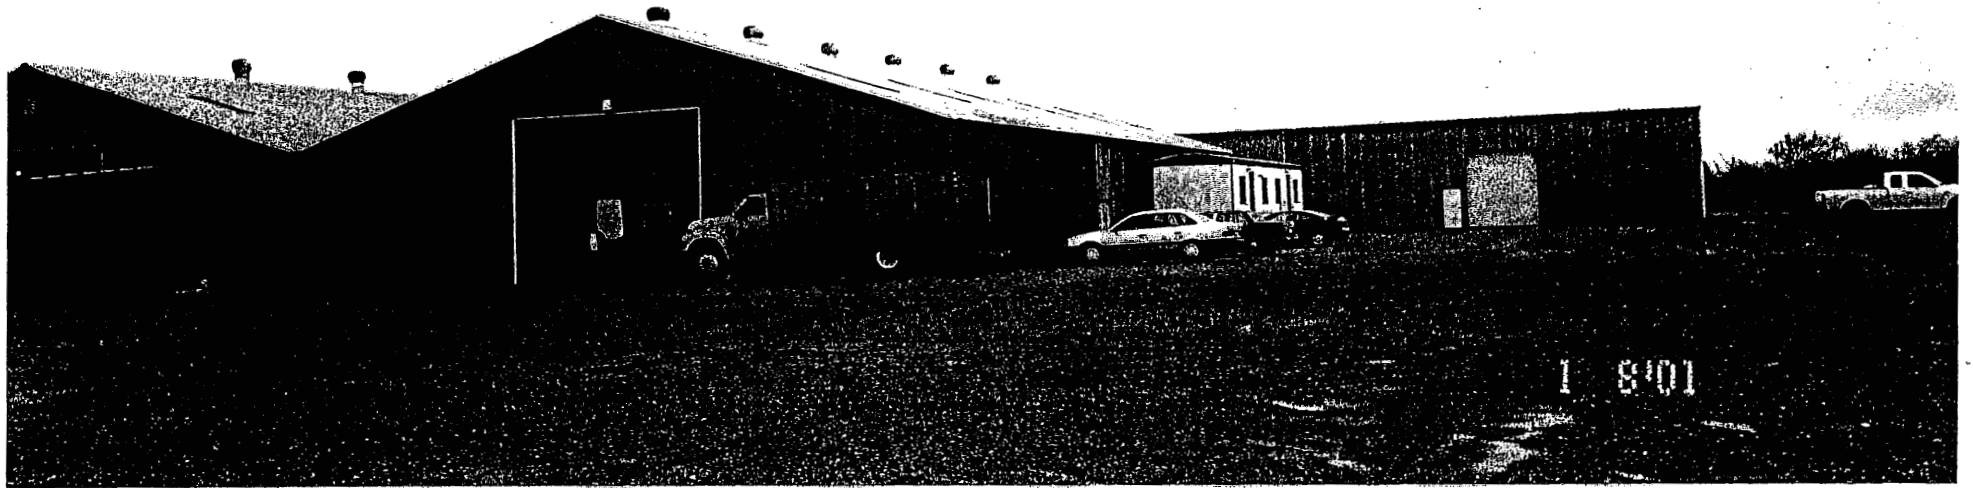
Photo C: View looking south easterly of the north and west exterior elevations of existing buildings.
